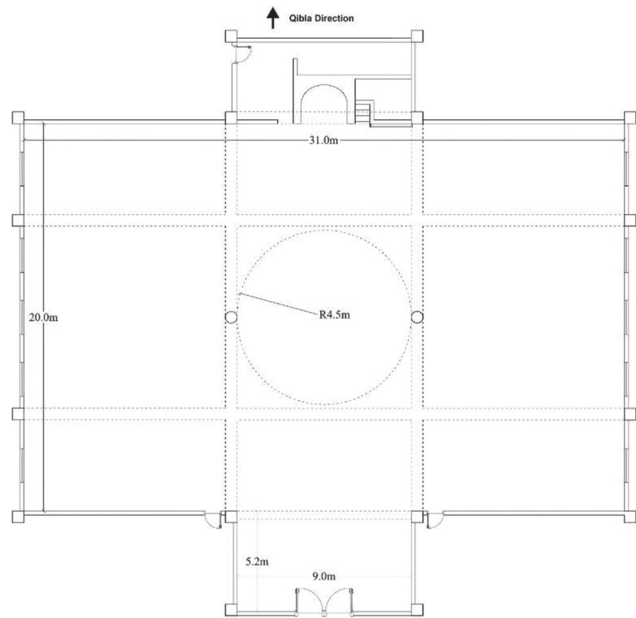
Main floor plan of the main prayer hall, Dayk Mosque.
